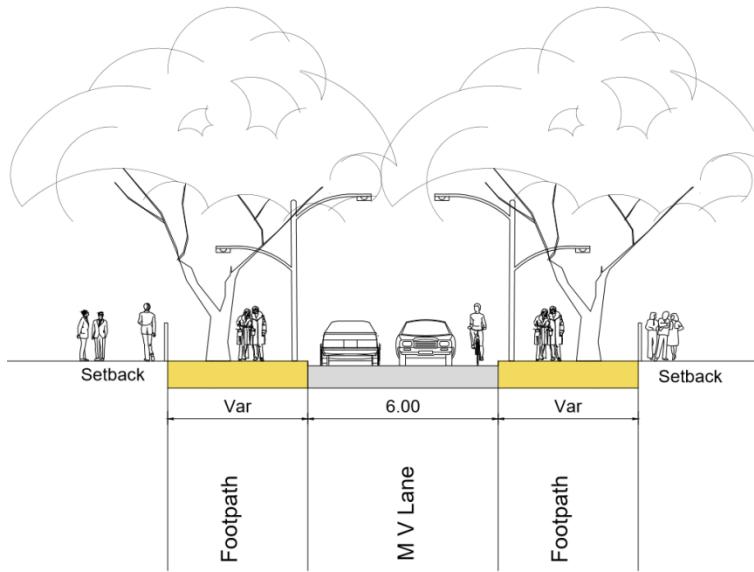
Two-way access road with shared use and space for on-street parking
